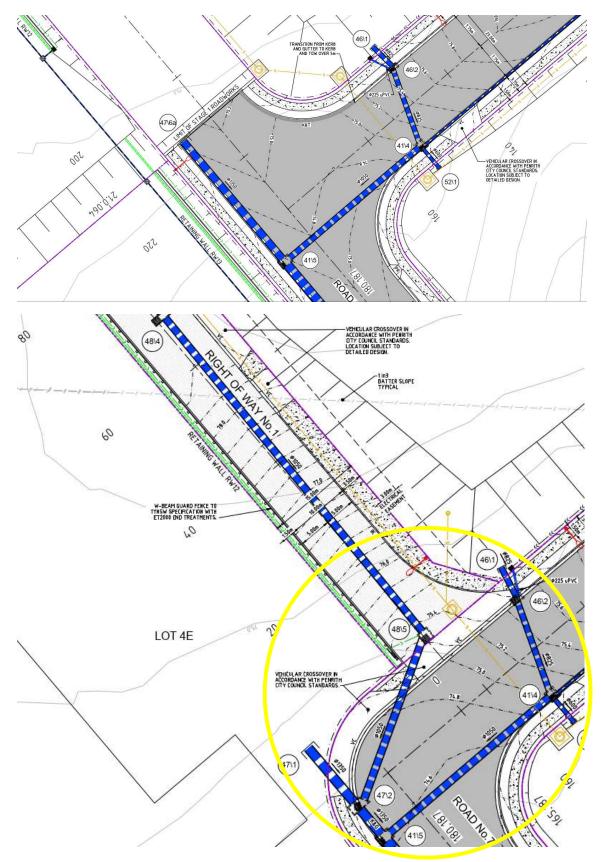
Modification No. 6 Design of the Road No. 6 and Road No. 7 Intersection (top) and Modification No. 7 Design of the Road No. 6 and Road No. 7 Intersection (bottom)
